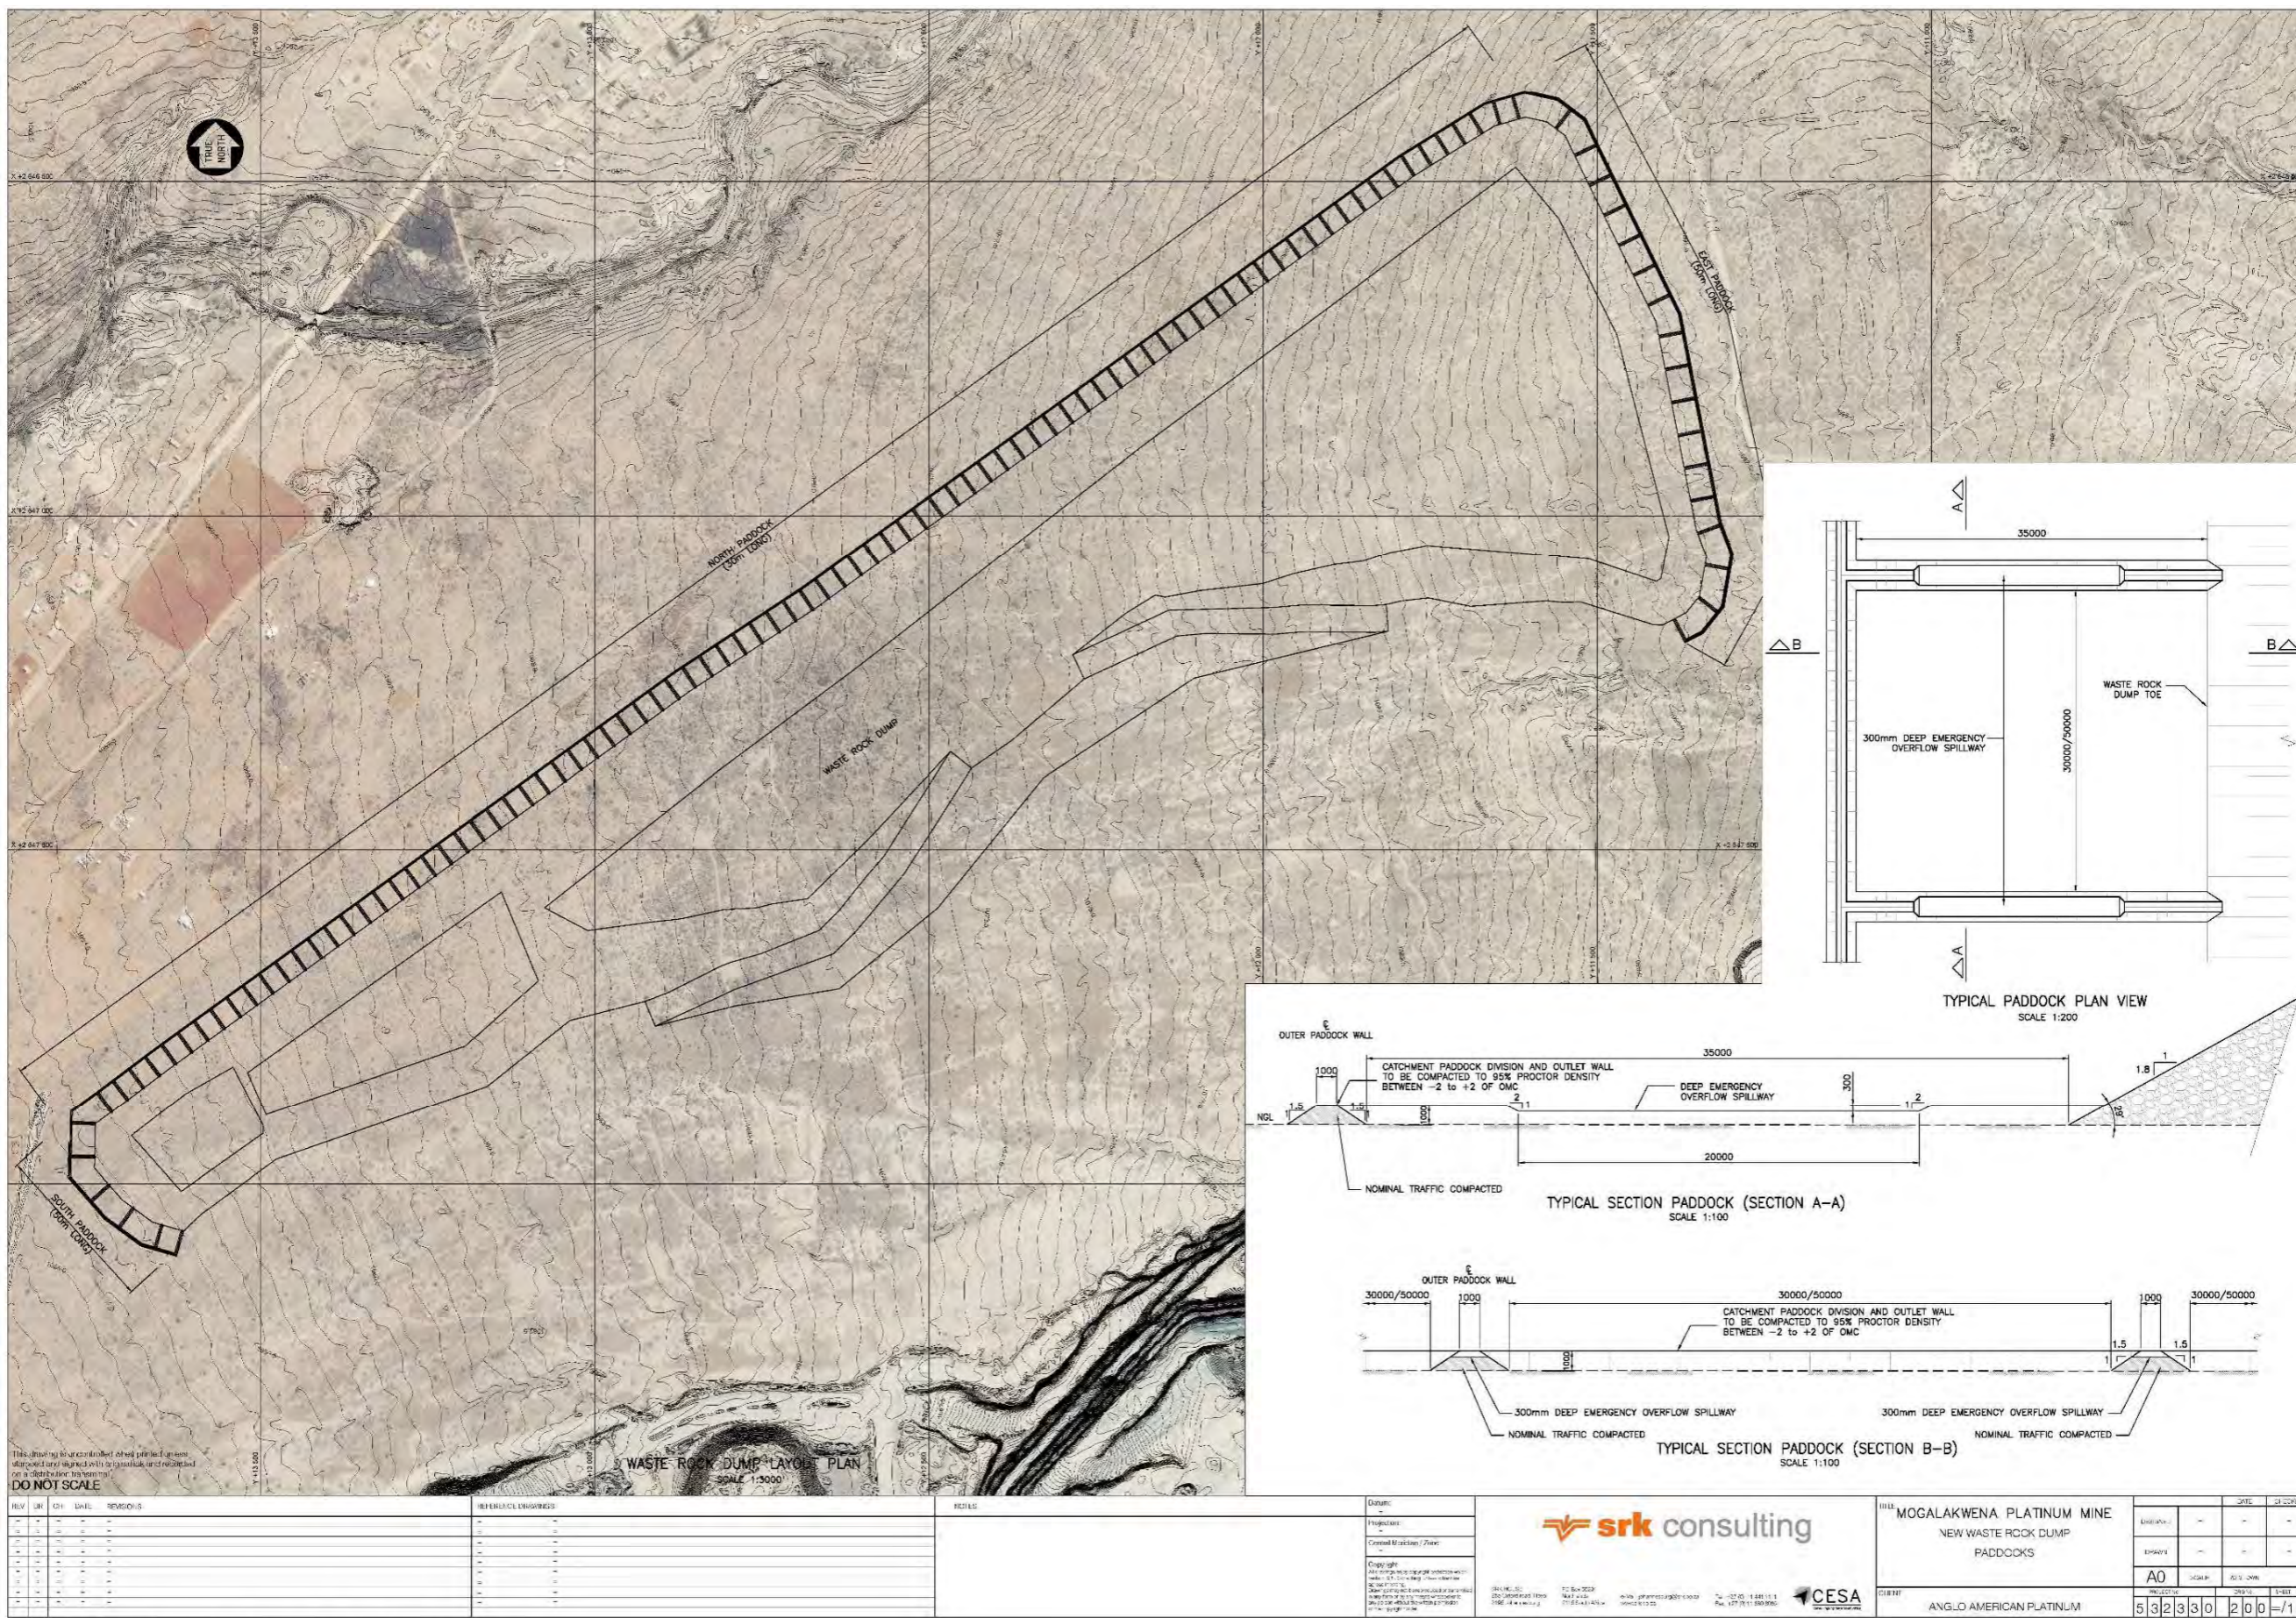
Proposed layout of the North WRD and Ore Stockpile Area
